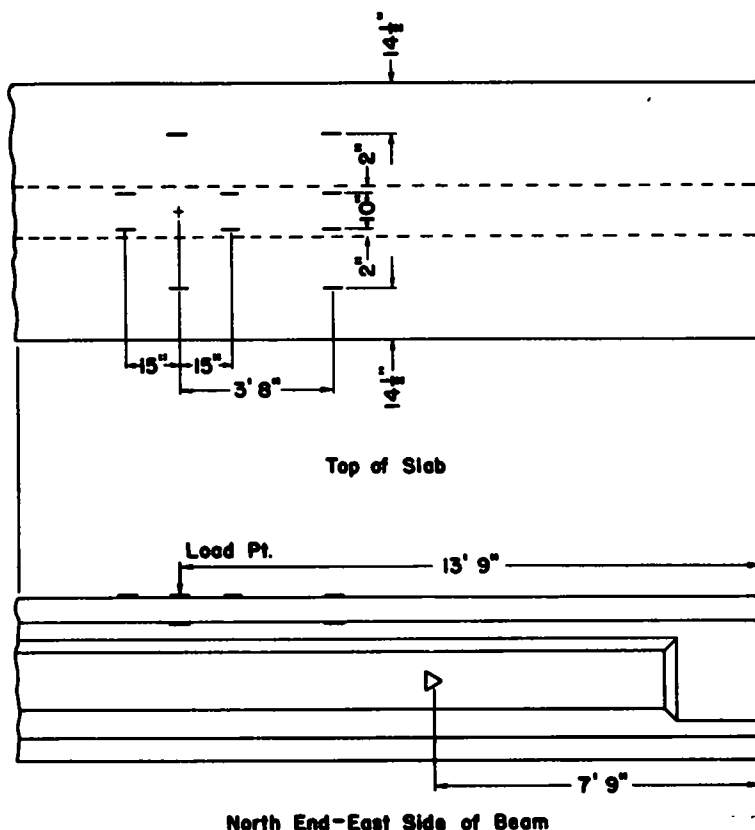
Strain gage locations, composite shear test, pretensioned beam.
